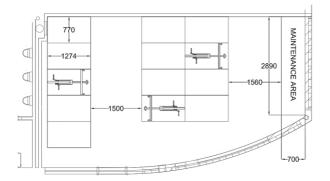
Proposed Location for visitor bike parking at the Union Street and Edward Street entry
